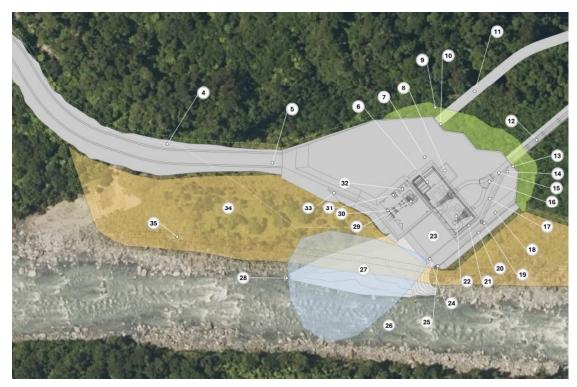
The Power Station Concept GA Plan, source: AusHydro.
